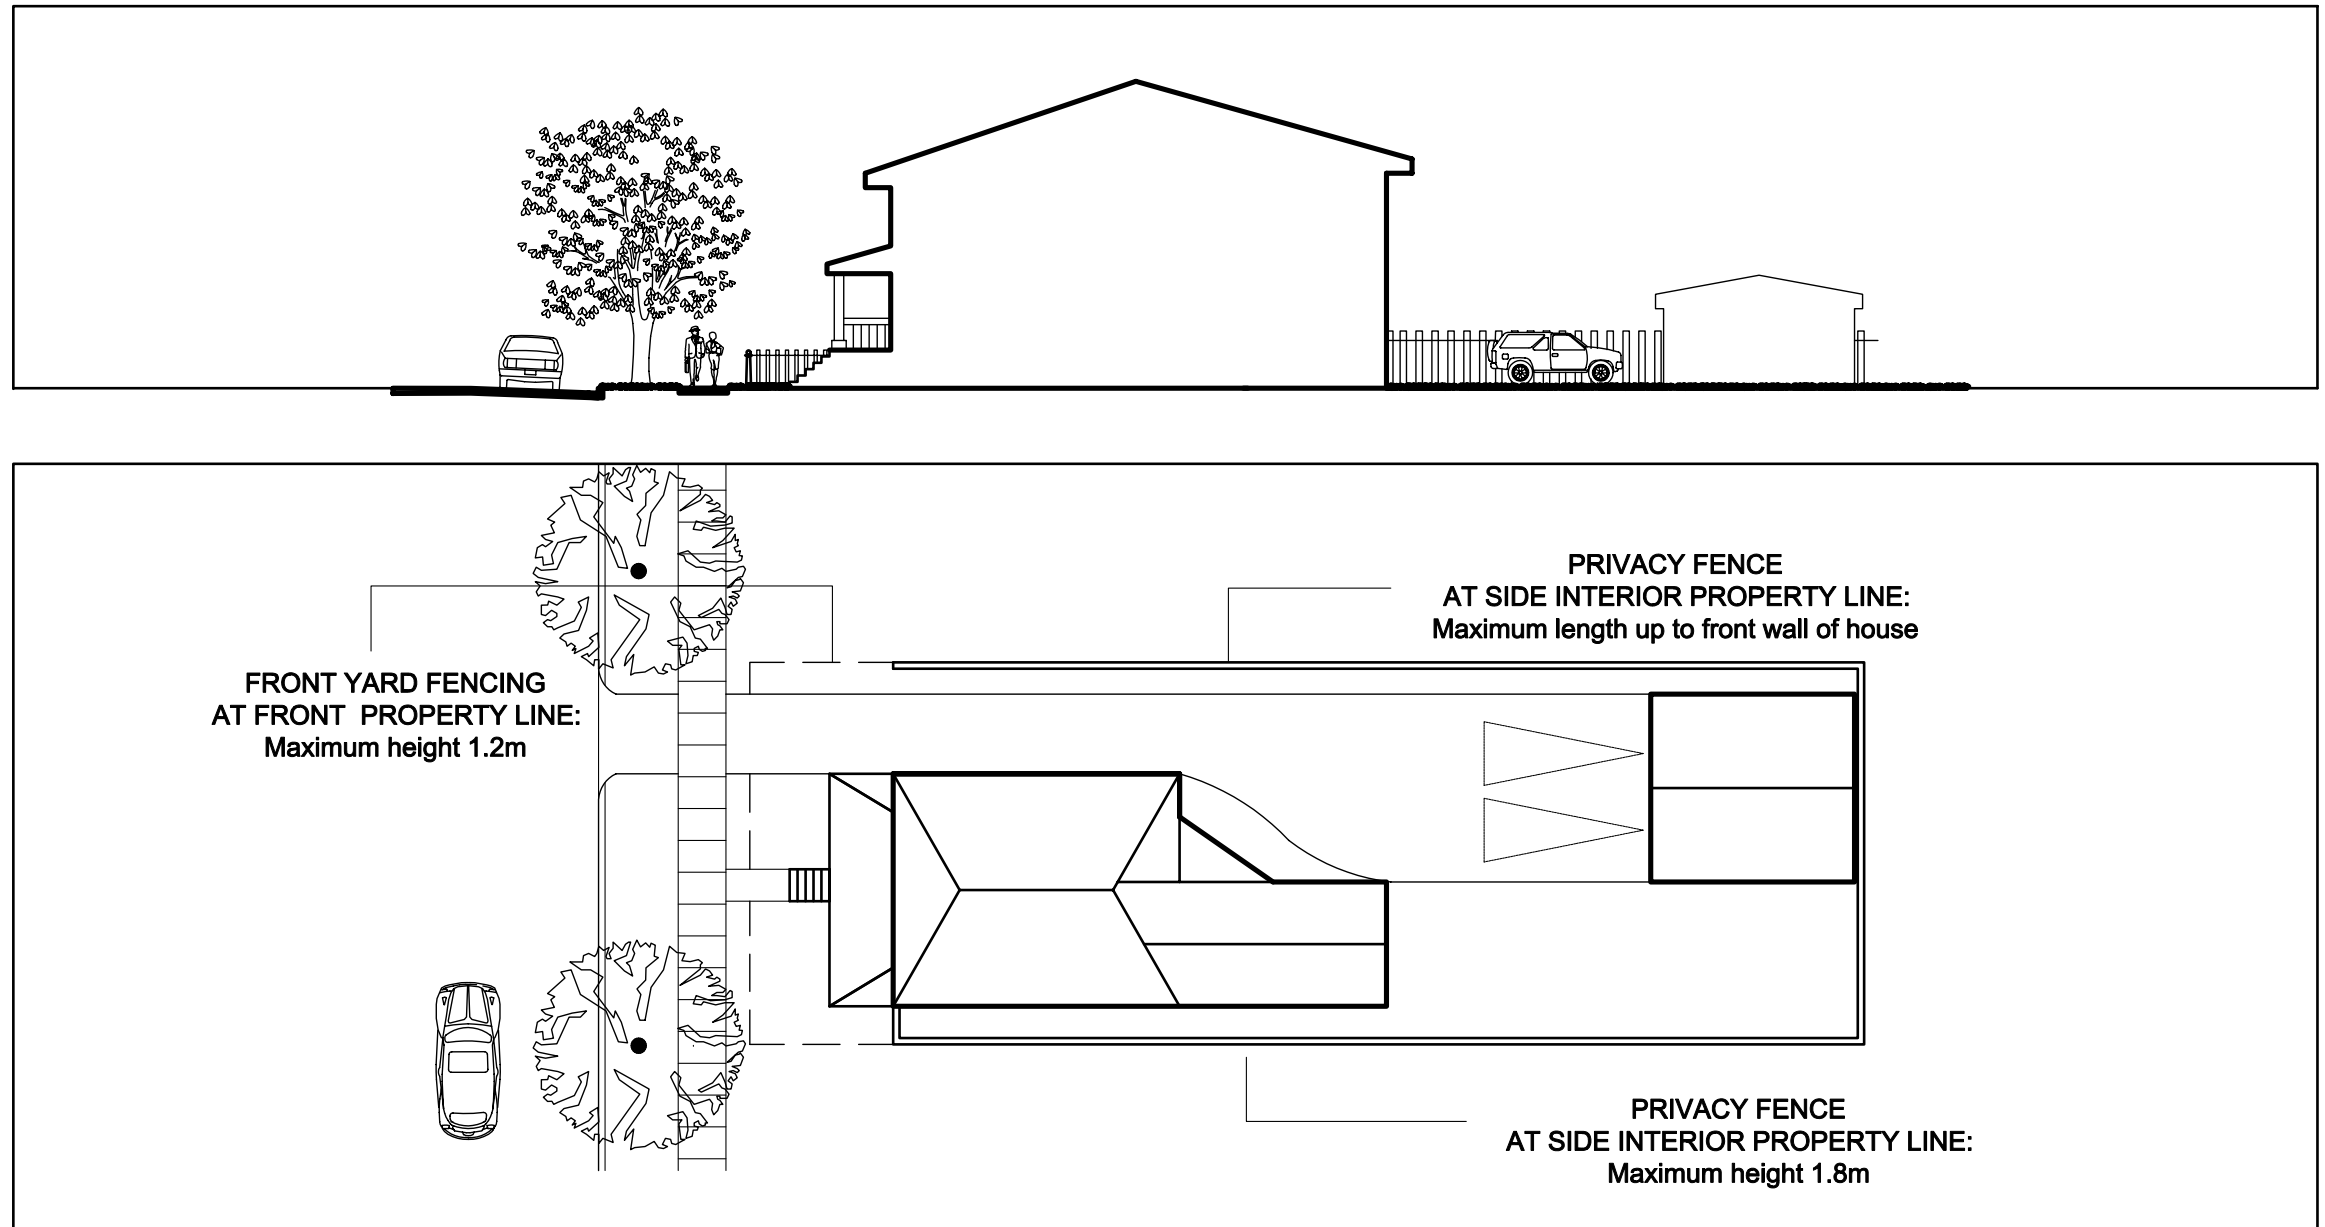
Fence Guidelines- Interior lot of a single detached house with a detached garage
